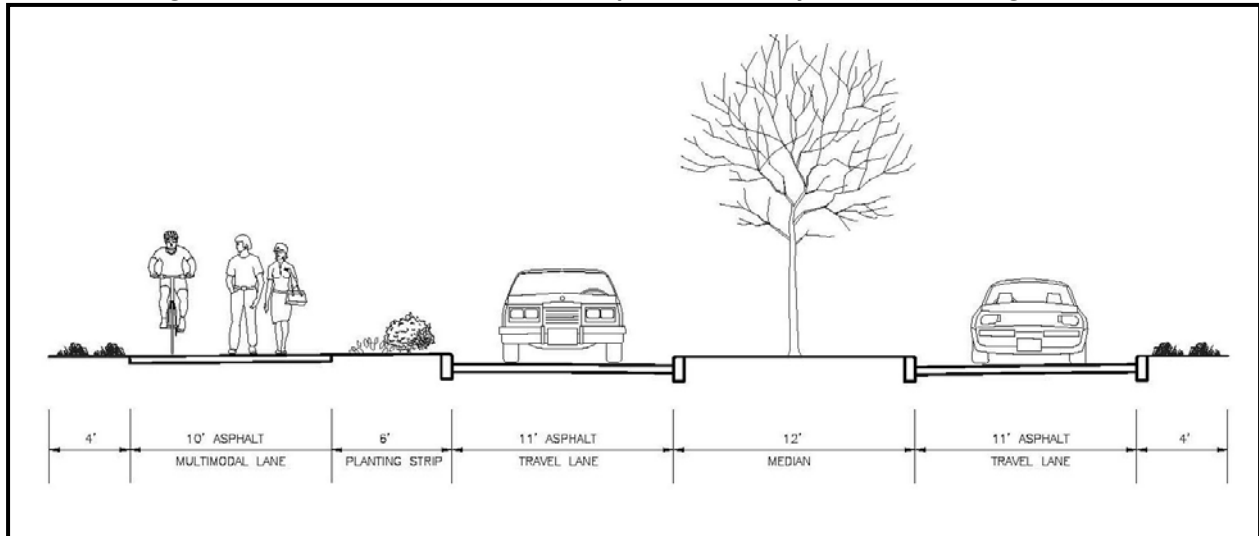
Noma Drive (Phase 1) - Proposed Roadway Layout
